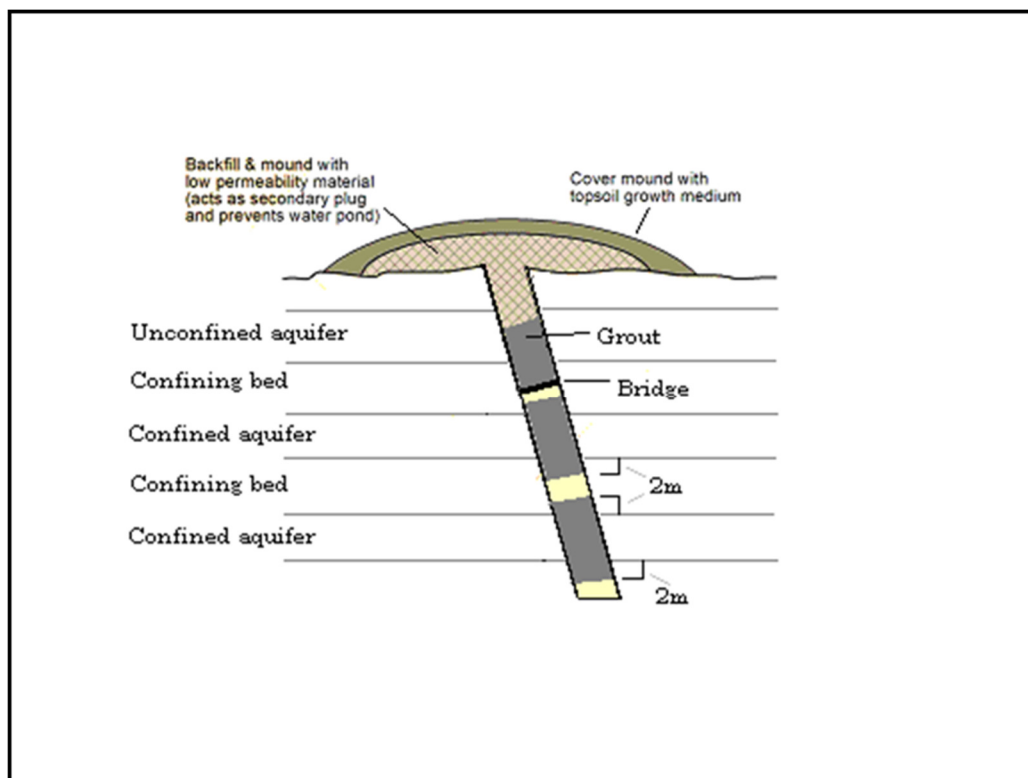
Capping and plugging of drill holes intersecting multiple aquifers
